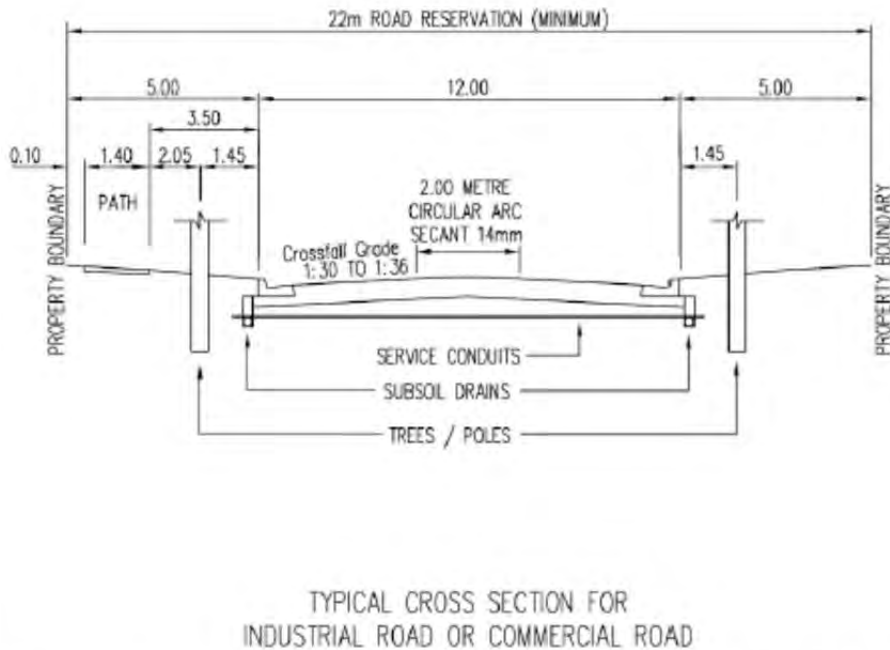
Typical Industrial Road Cross Section, City of Greater Dandenong SD005
